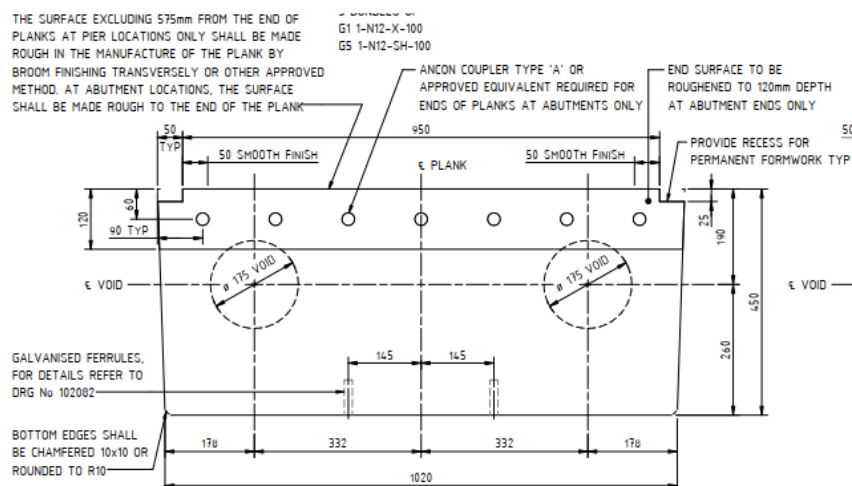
Typical Pre-tensioned 1050mm wide Planks Details
